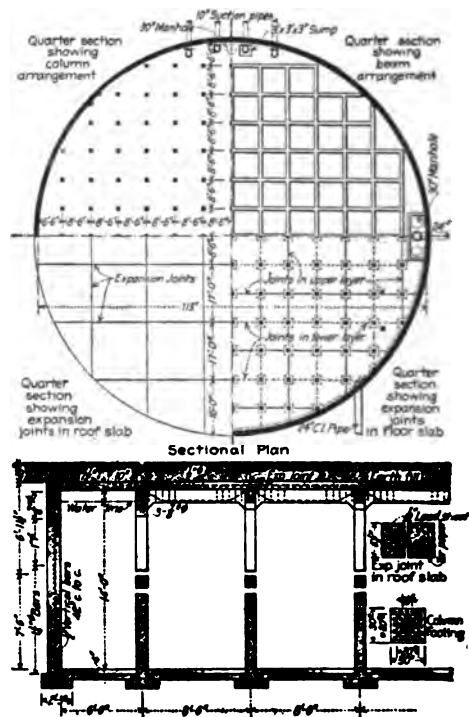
Covered equalizing and storage reservoir for Hibbing water-works.
